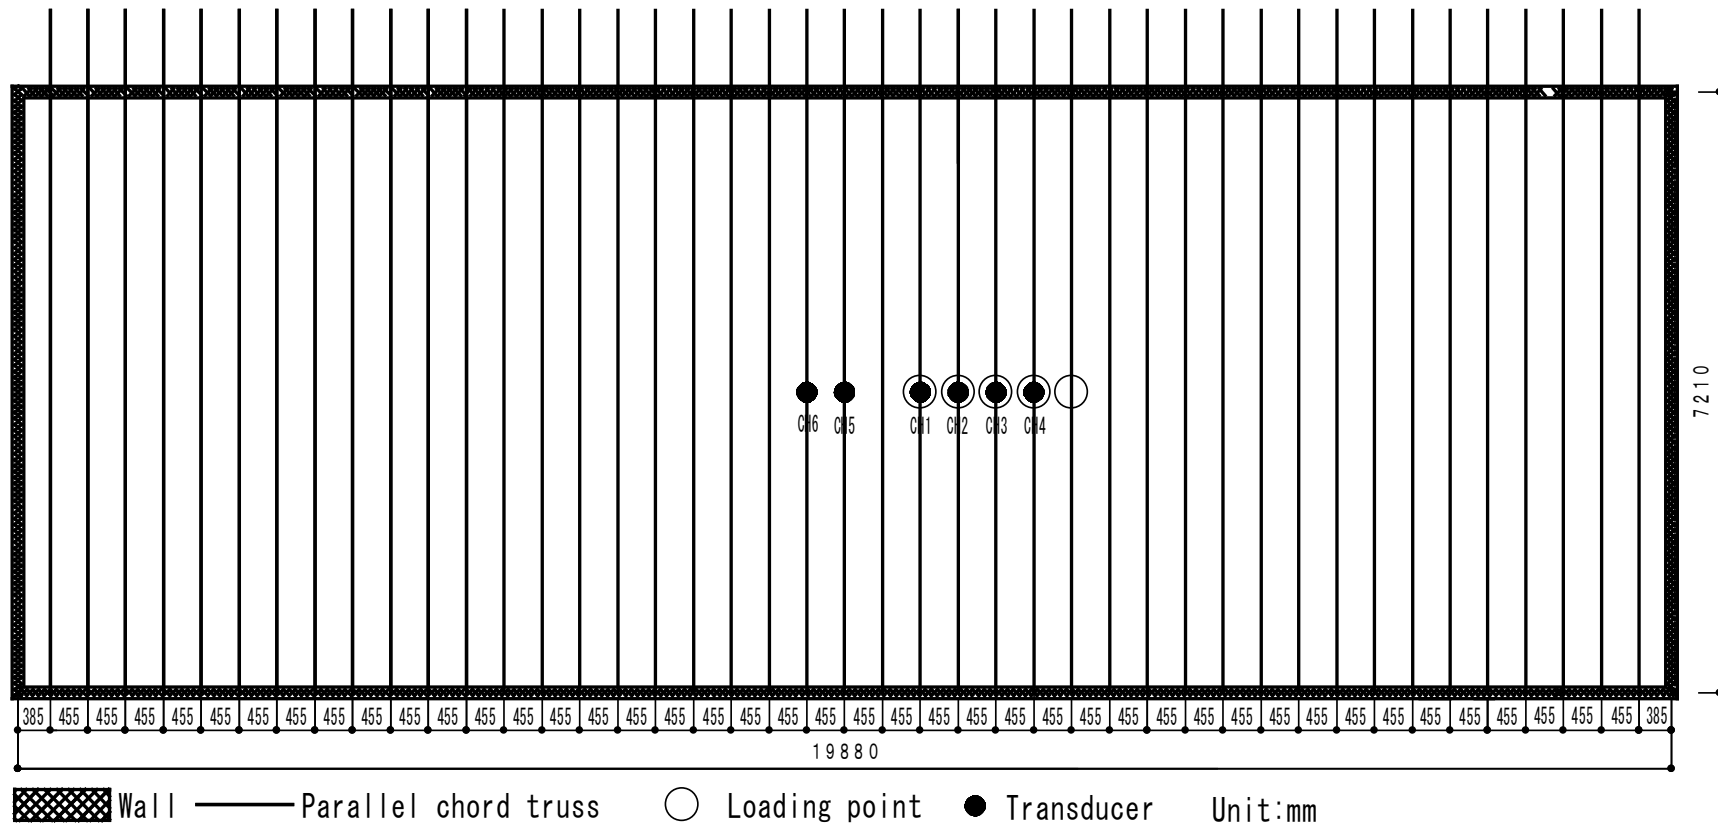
Upstairs floor framing plan of a measured room in office F.
